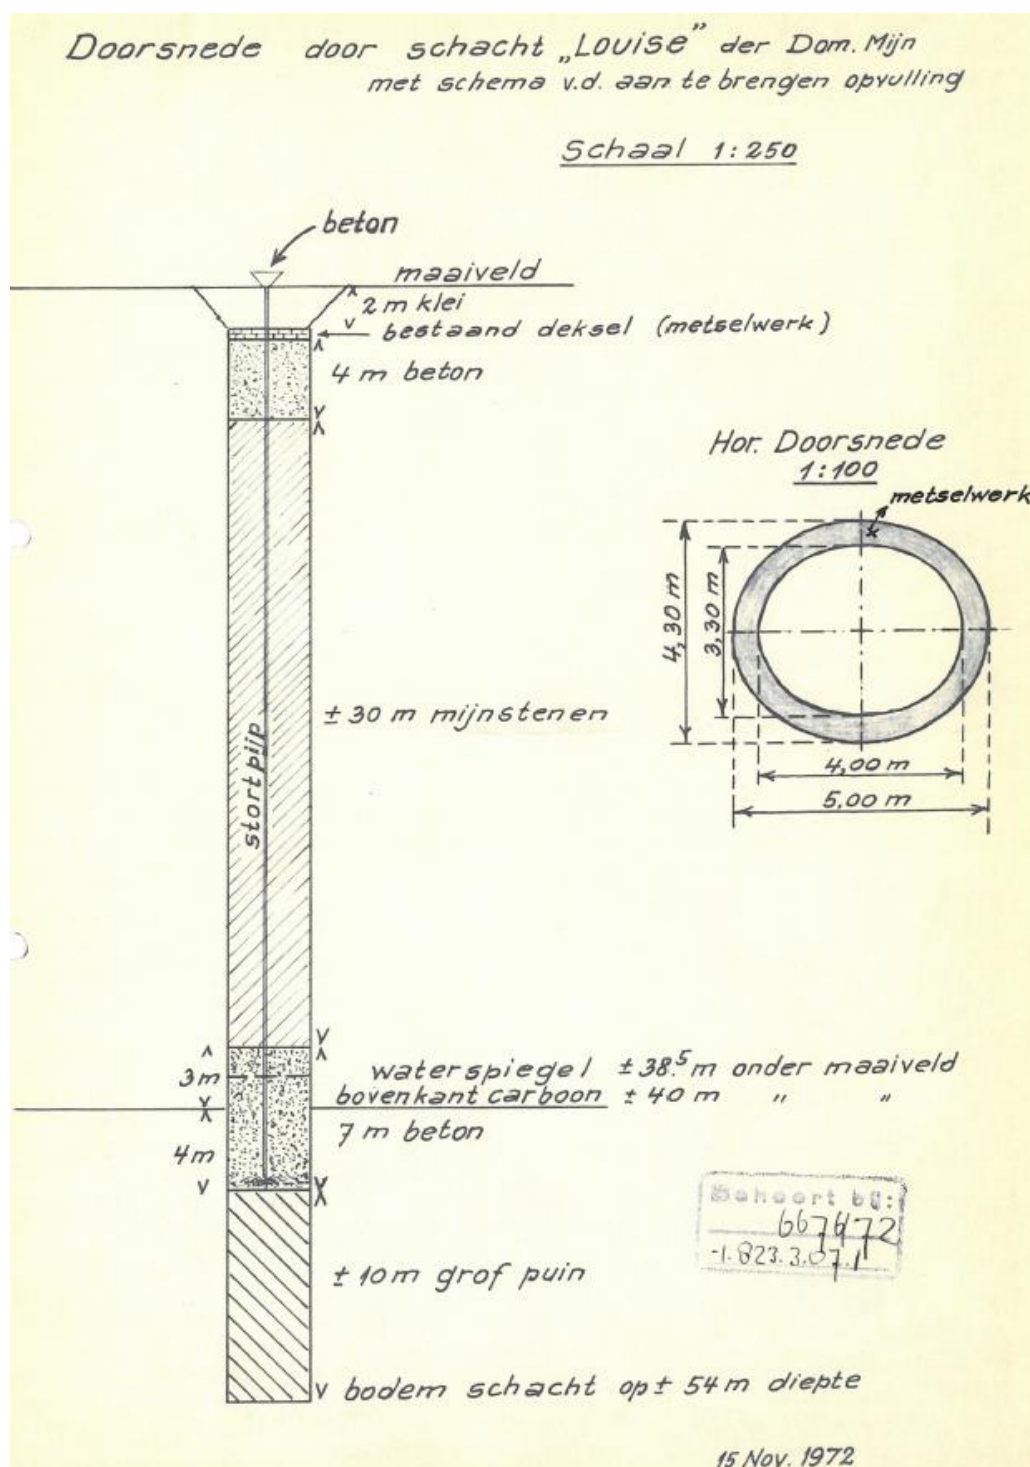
Section drawing shaft Louise with implementation planning /63/
